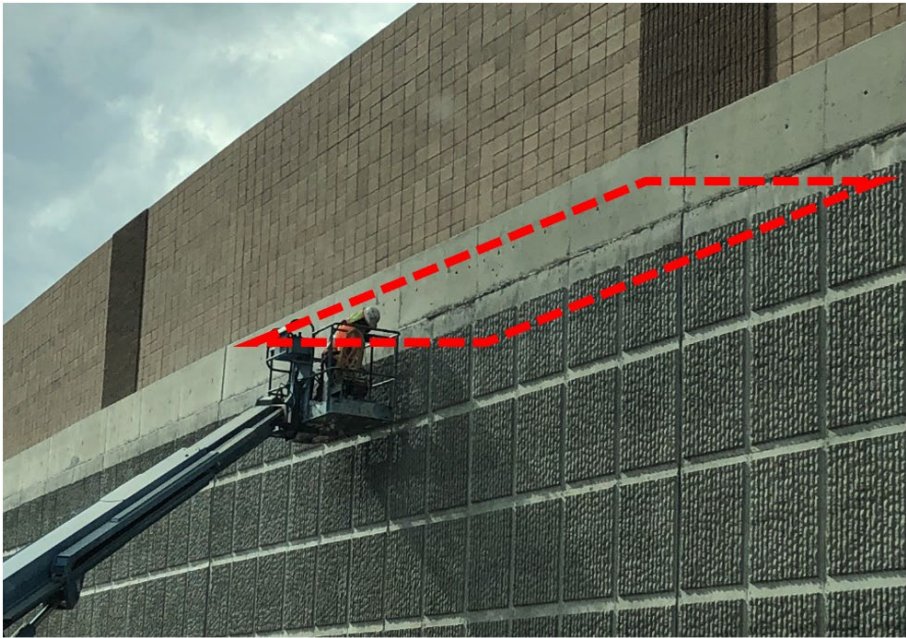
Barrier Constructed Without Form Support Requiring Extensive Finish Work
